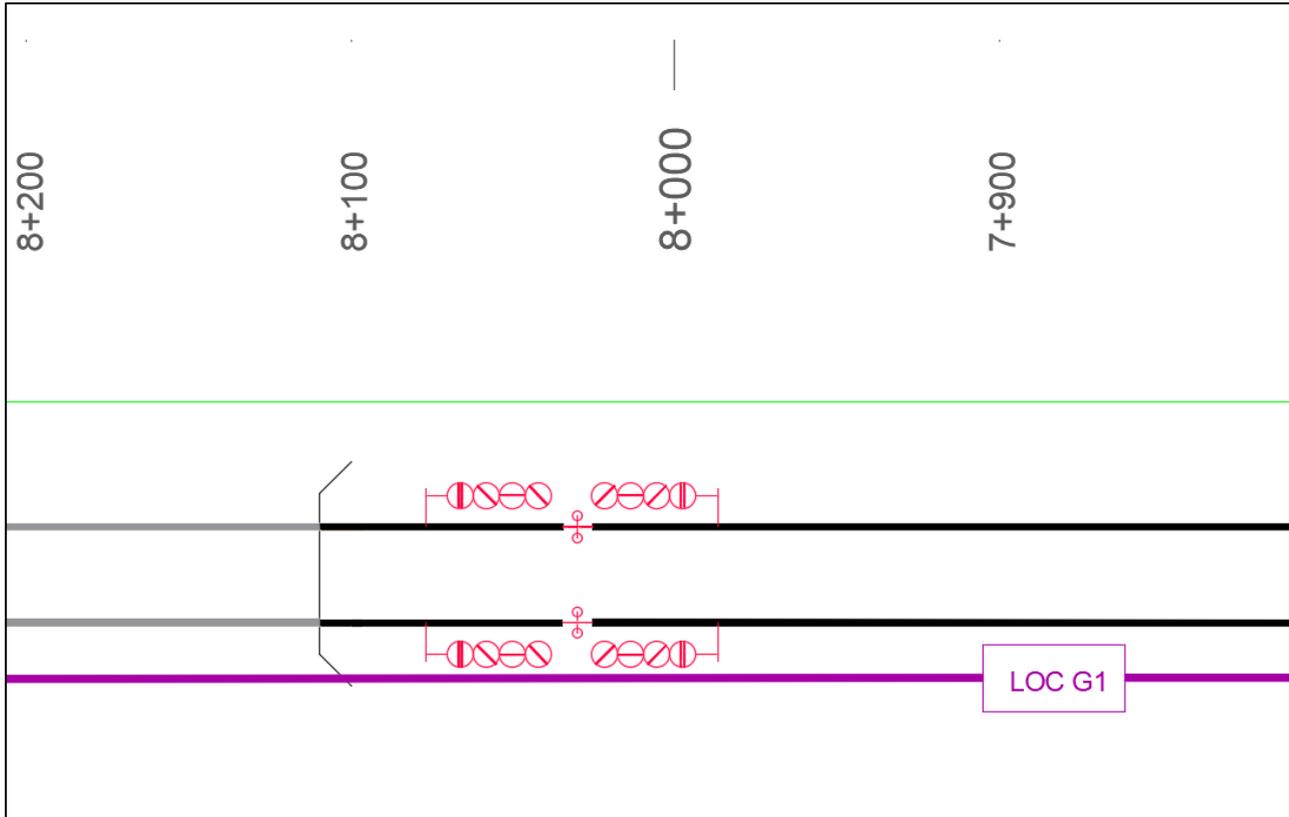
Signalling Scheme Plan (North Entrance at Phoenix Park Tunnel)
